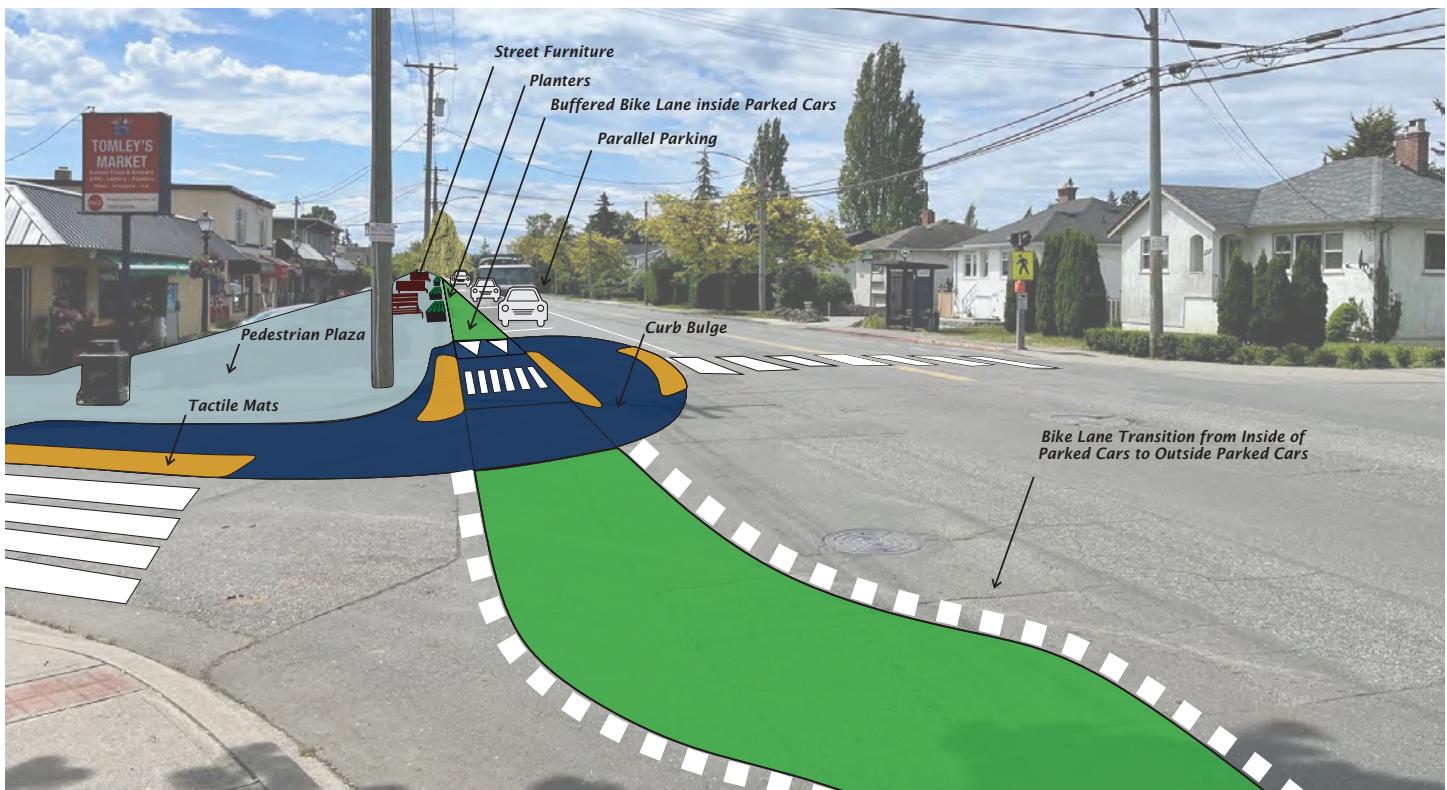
and 7.16 present existing and conceptual design of the intersection at Musgrave Street and Dalhousie Street. This is an example of an intersection that could benefit from the following design measures to make Foul Bay Road more human-scaled:
